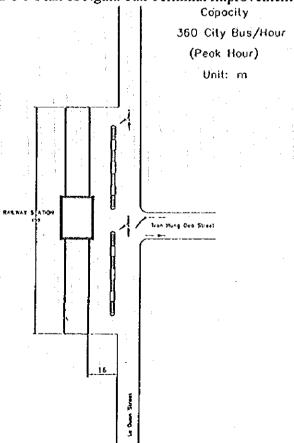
Plan of Terminal in front of Hanoi Station
